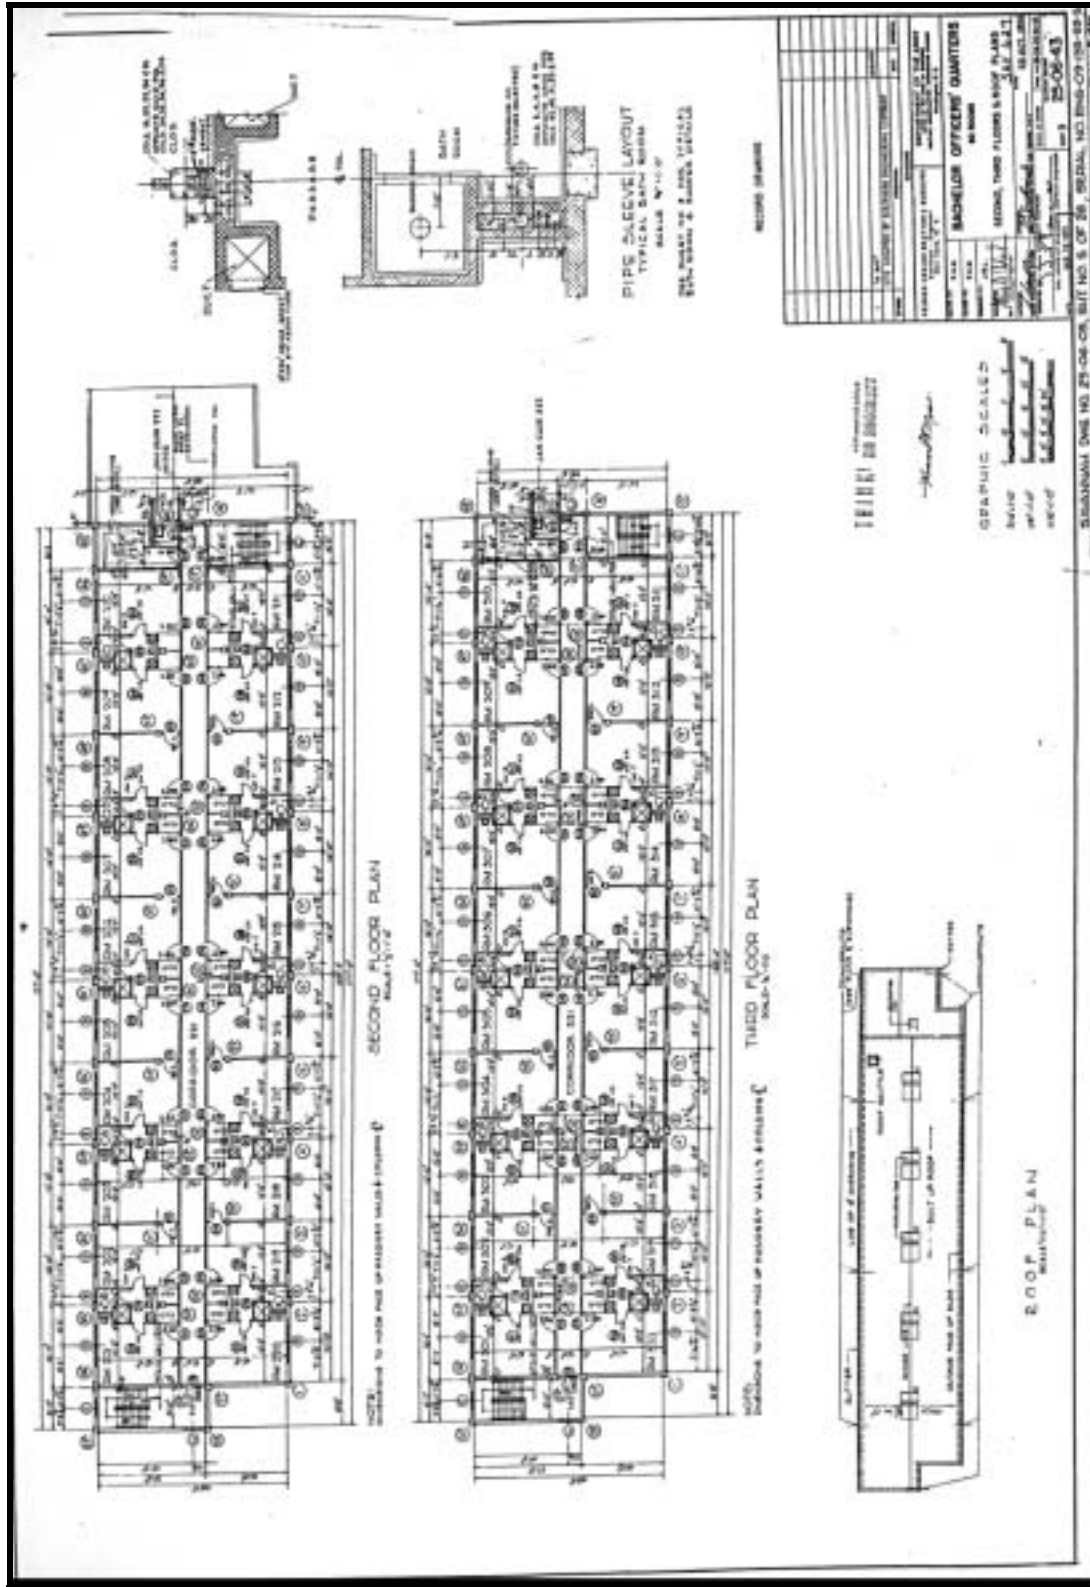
Three-story, hammerhead BOQ, second, third, and roof plans, Ft. Benning (1955) (Engineering, Ft. Benning).
